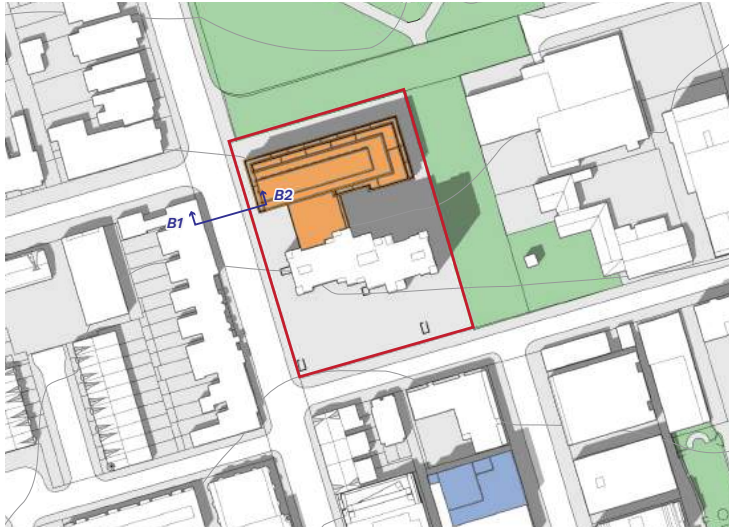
Proposed Site Plan - Setbacks and Separation Distances
